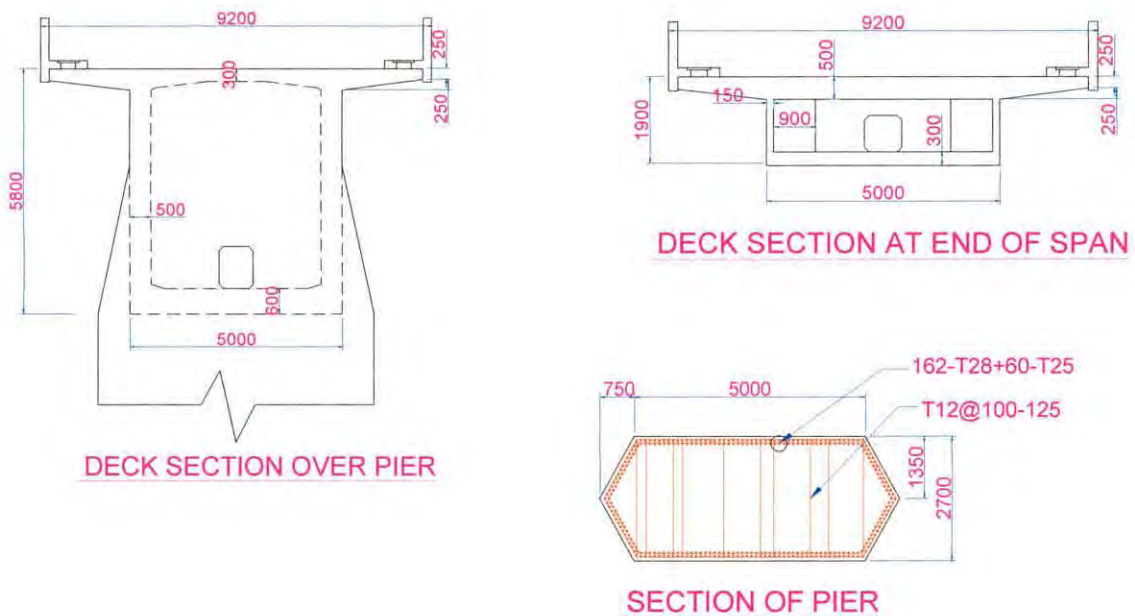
Cross section of deck and pier of Meghna Bridge
